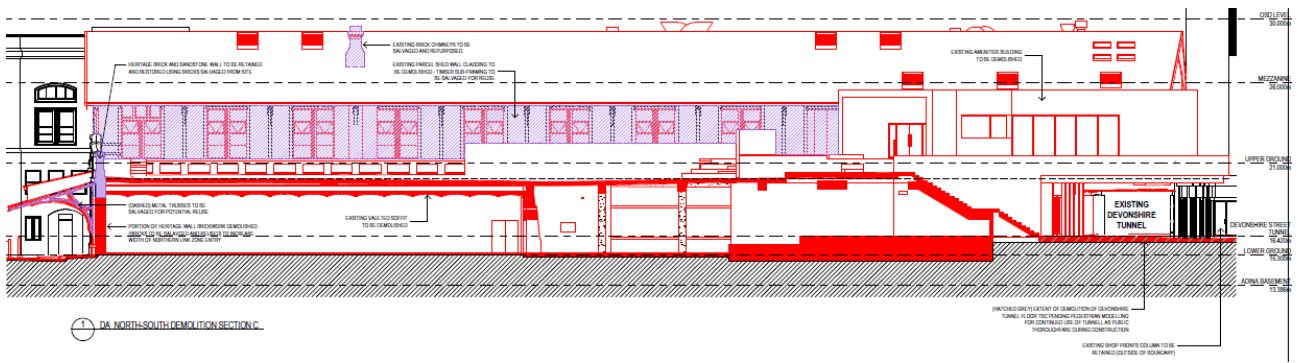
Extract of demolition and dismantling plan: lower ground section and upper ground elevation
